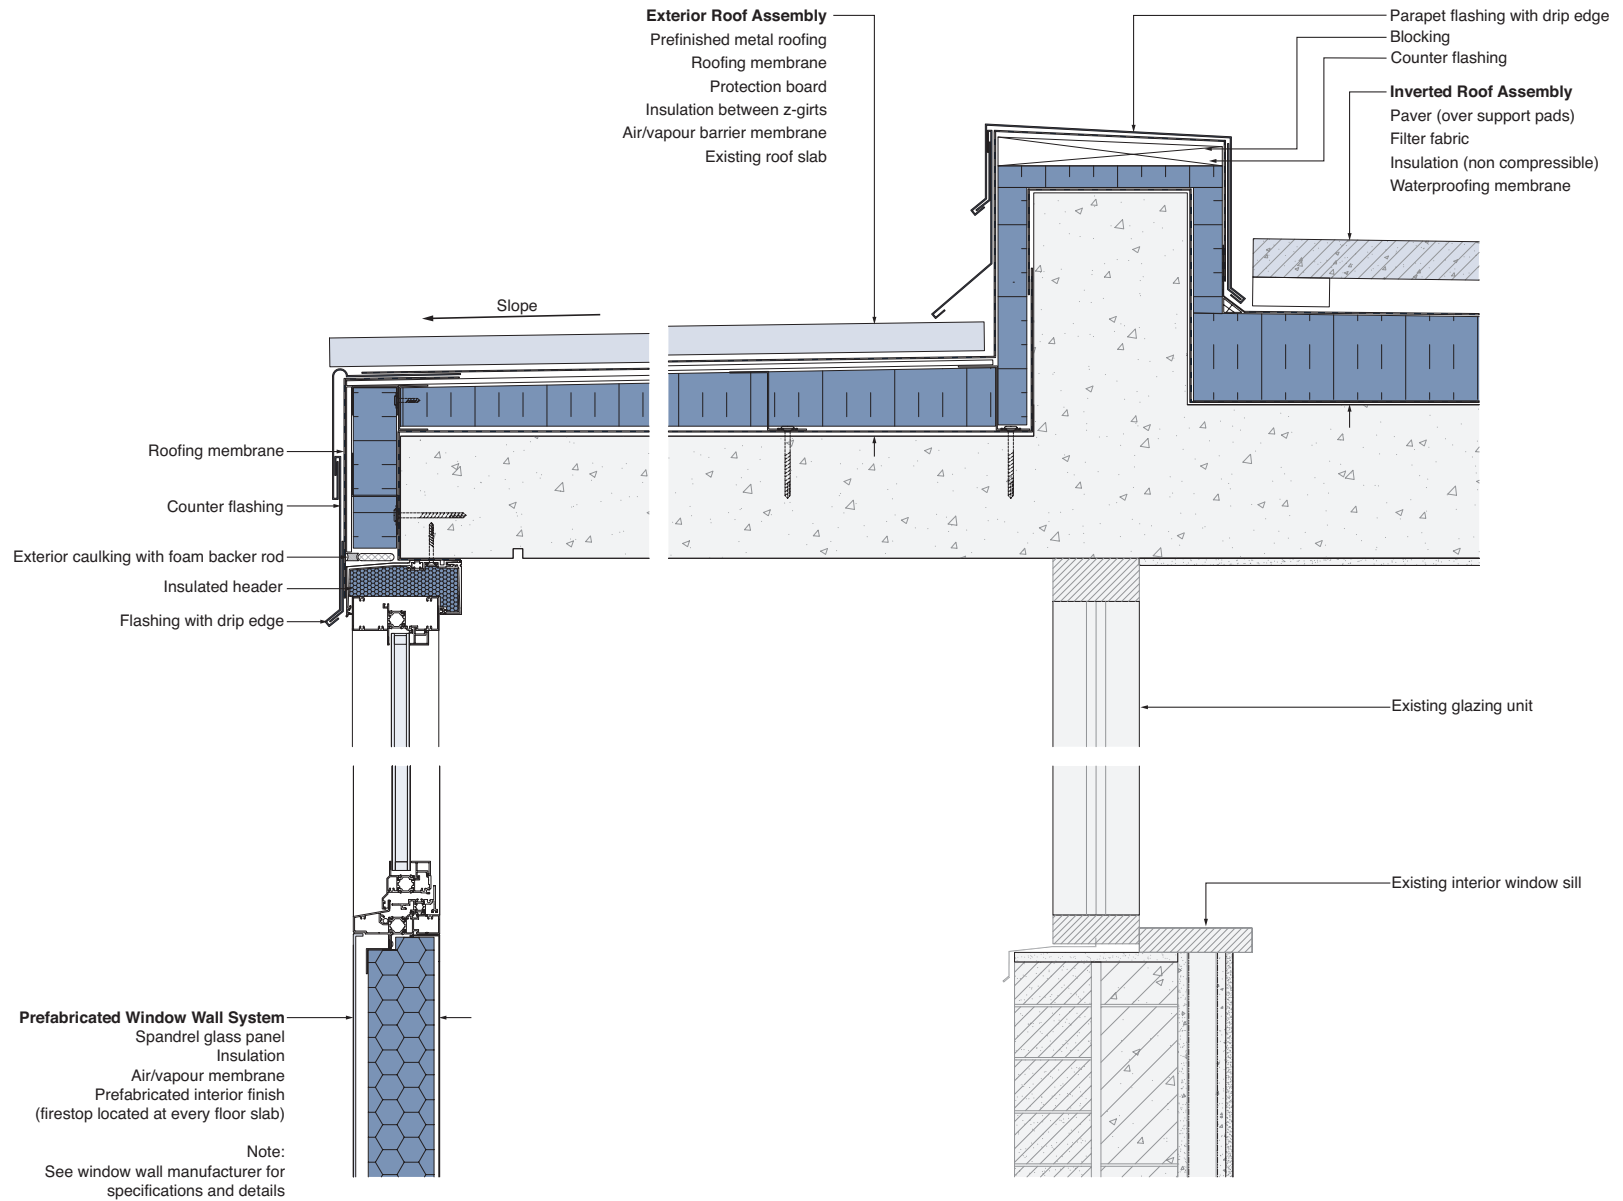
Section detail of enclosed balcony and replacement roofing. The projection on the flashing over the top of the balcony enclosure glazing should be designed to convey the water away from the enclosure face to avoid staining and potential leakage through open windows.
